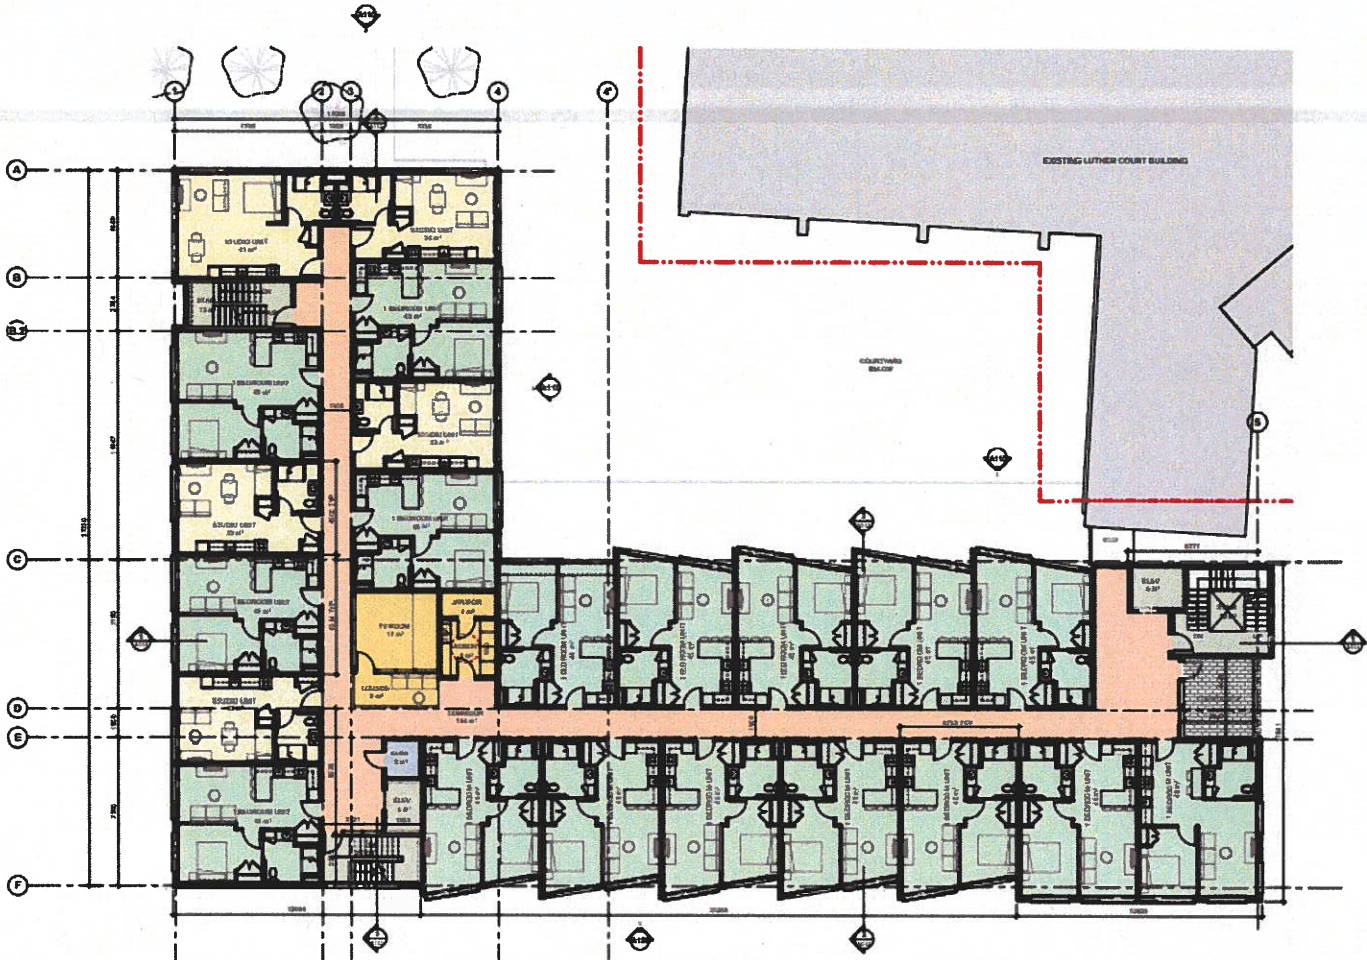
Standard Floor Plan Proposed (provided by Studio 531 Architects Inc.)
